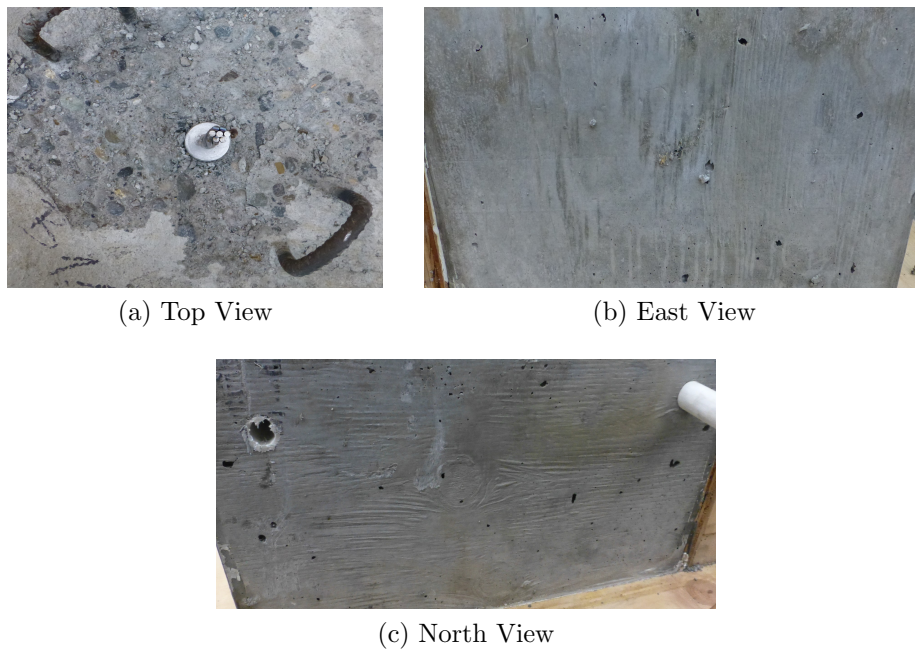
Specimen B_1_O_1.75 Crack Patterns
